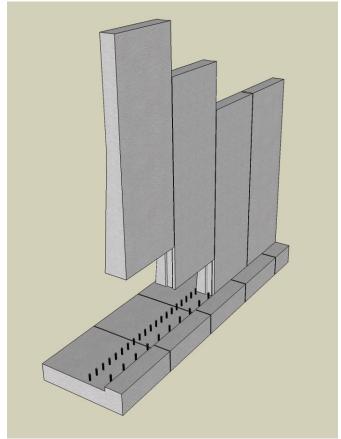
Precast Concrete Cantilever Wingwall
